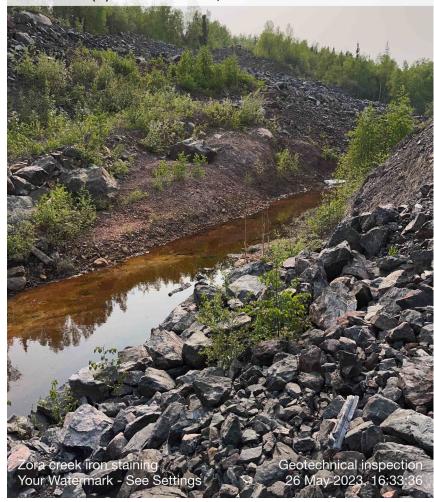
View from level crossing looking upstream towards Zora Lake (May 2023)
